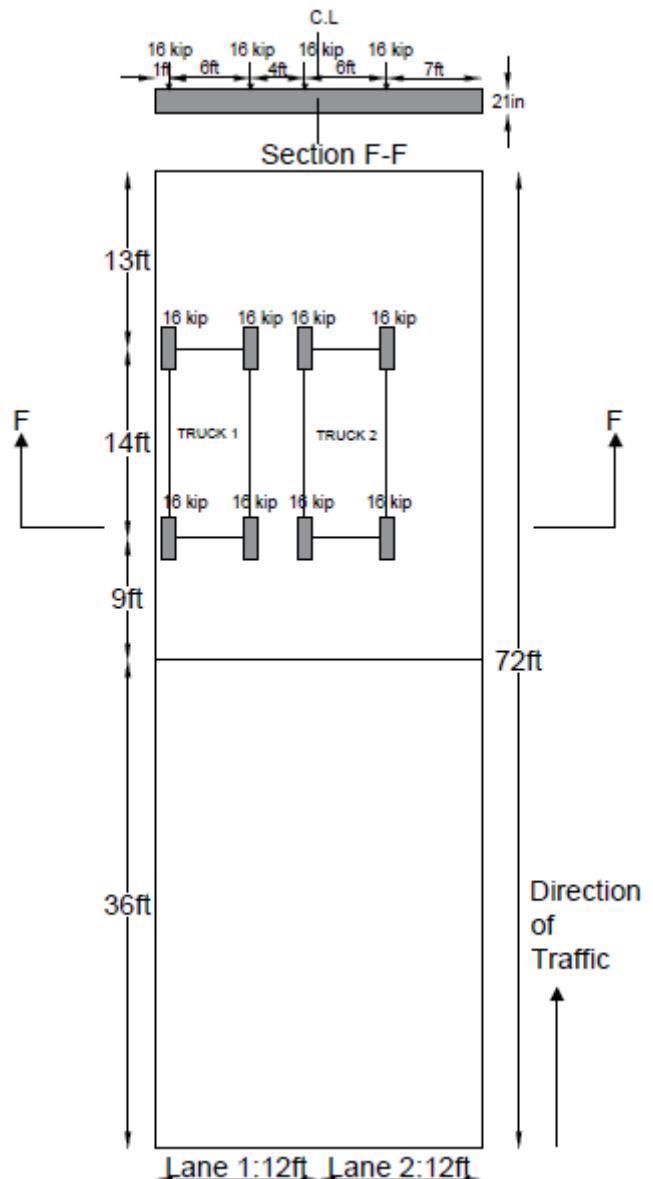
Typical Cross-Section and Plan of Two-Lane 36ft Span Bridge under Center-Center Loading Condition with no railing (Negative moment).
